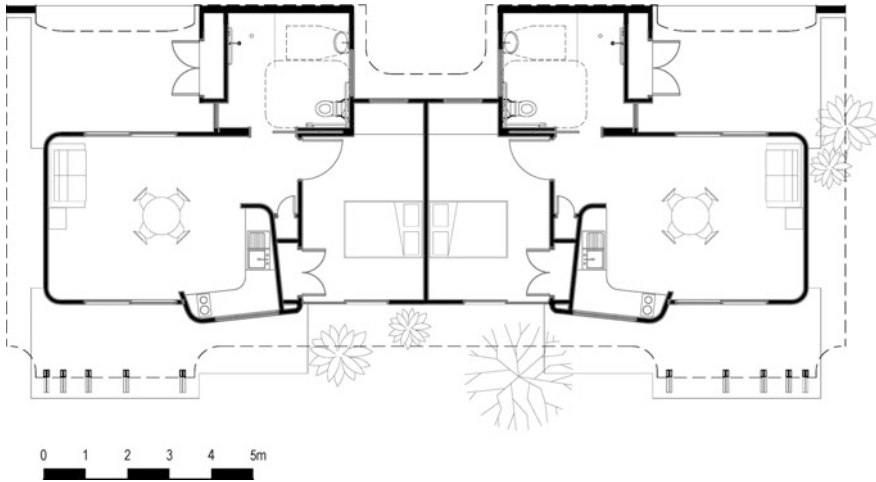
Plan of accommodation units (*Drawing People Oriented Design*)
